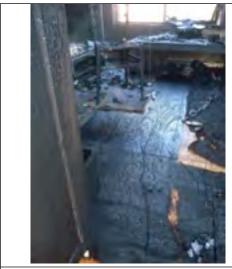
Floor burn patterns to plywood sheeting of burn cell #3.
